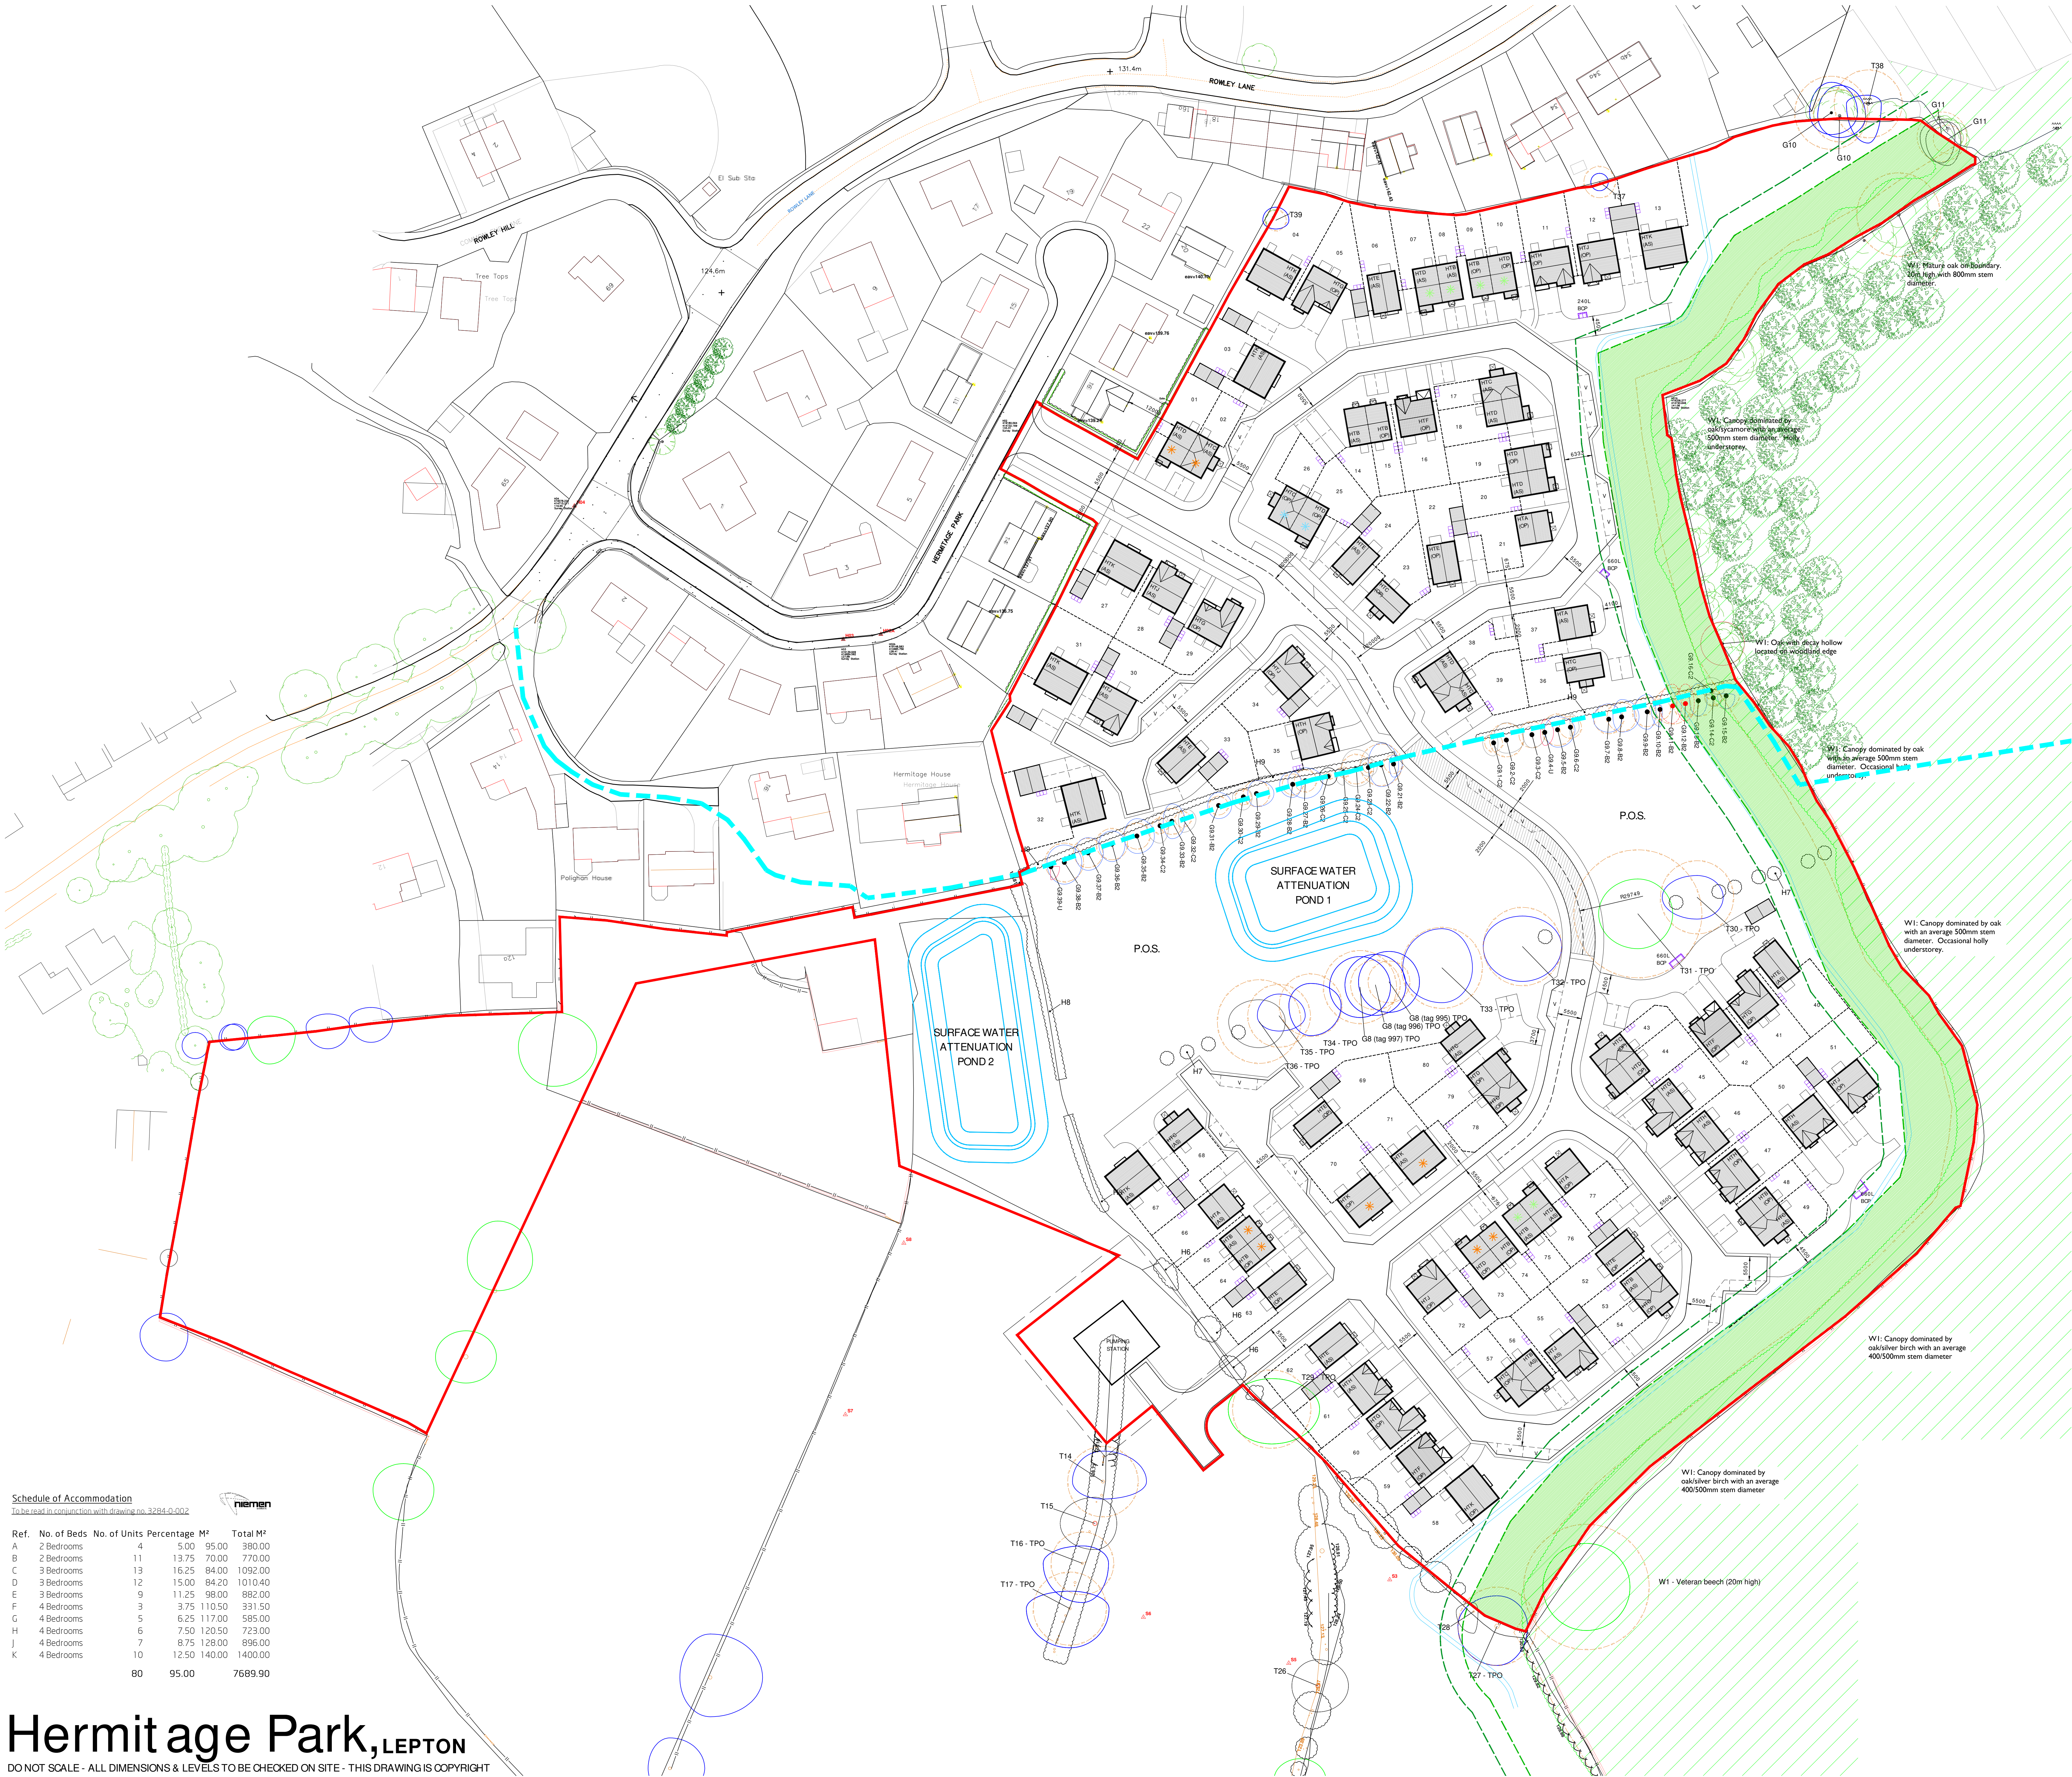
Rev DD - Proposed Site Layout
